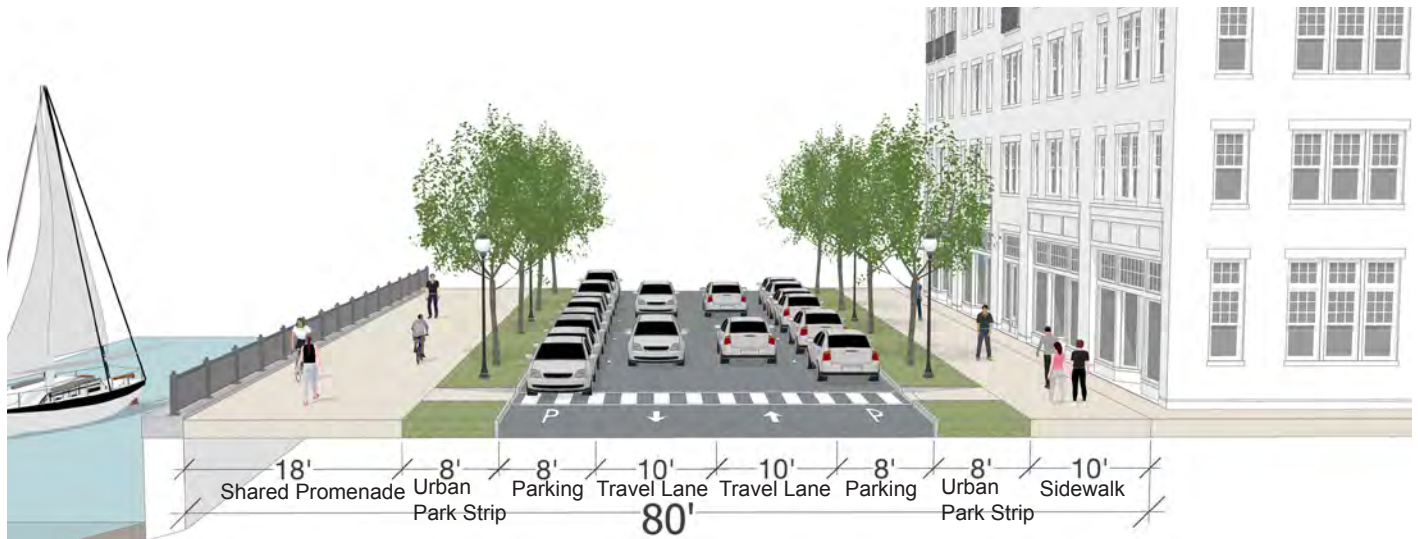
(4). Lake Road Marina Section (illustrative)
